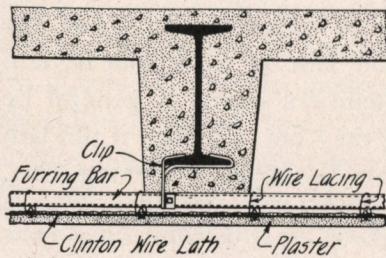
Clipped Ceiling Attached to Steel Beams with Concrete Fireproofing
